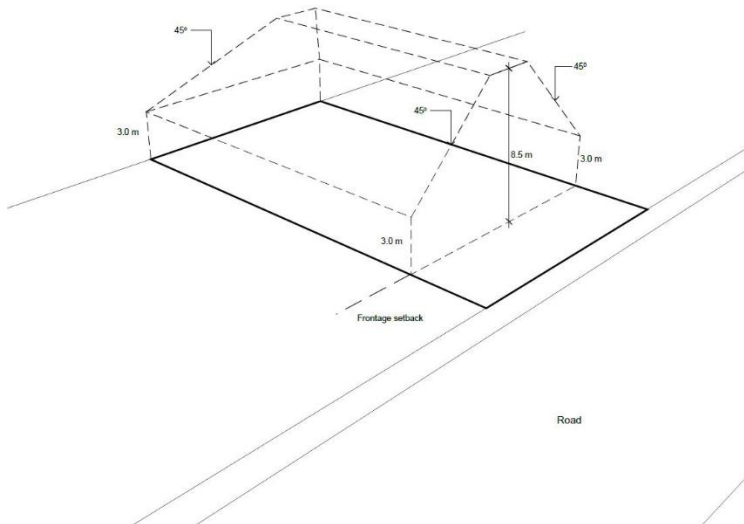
Building envelope as required by clause 10.4.2 A3(a)
